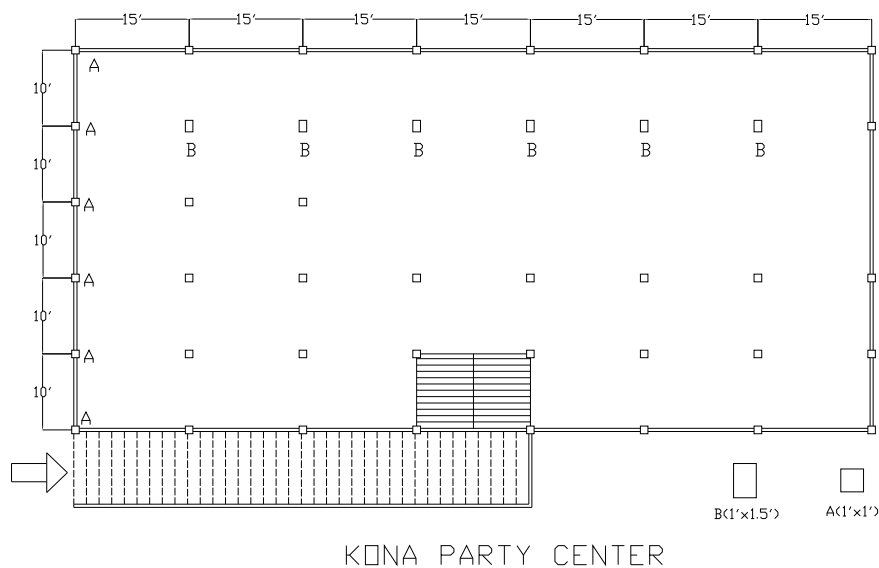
Building Plan of Kona Party Center (Ground Floor)
